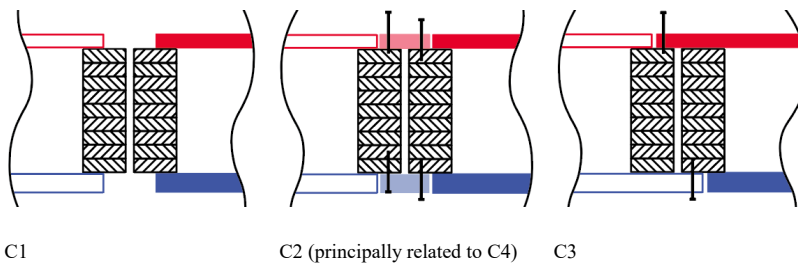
Section view (in direction of span) of element interconnections: C1: No connection, C2: Board/bridge connection with twin row of fasteners at top and bottom level, C3: Intersecting connection with single row of fasteners at both levels.
